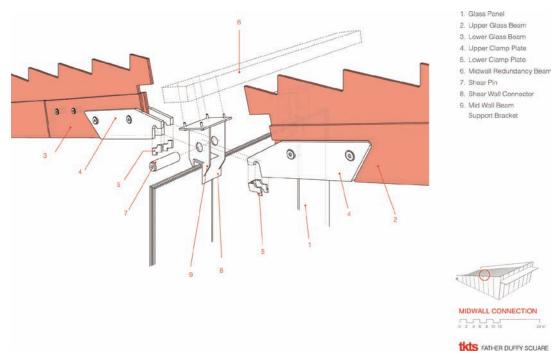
Midwall connection detail. A load-bearing four-ply glass wall supports the upper and lower beam ends.
